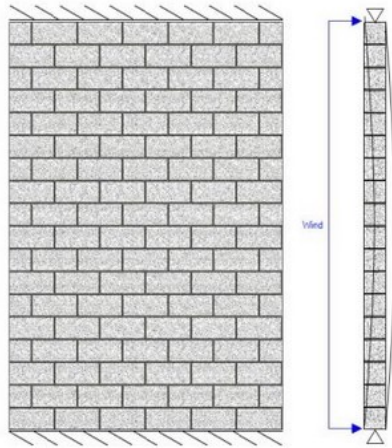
Vertical bending (Canada Masonry Design Center, 2017)
